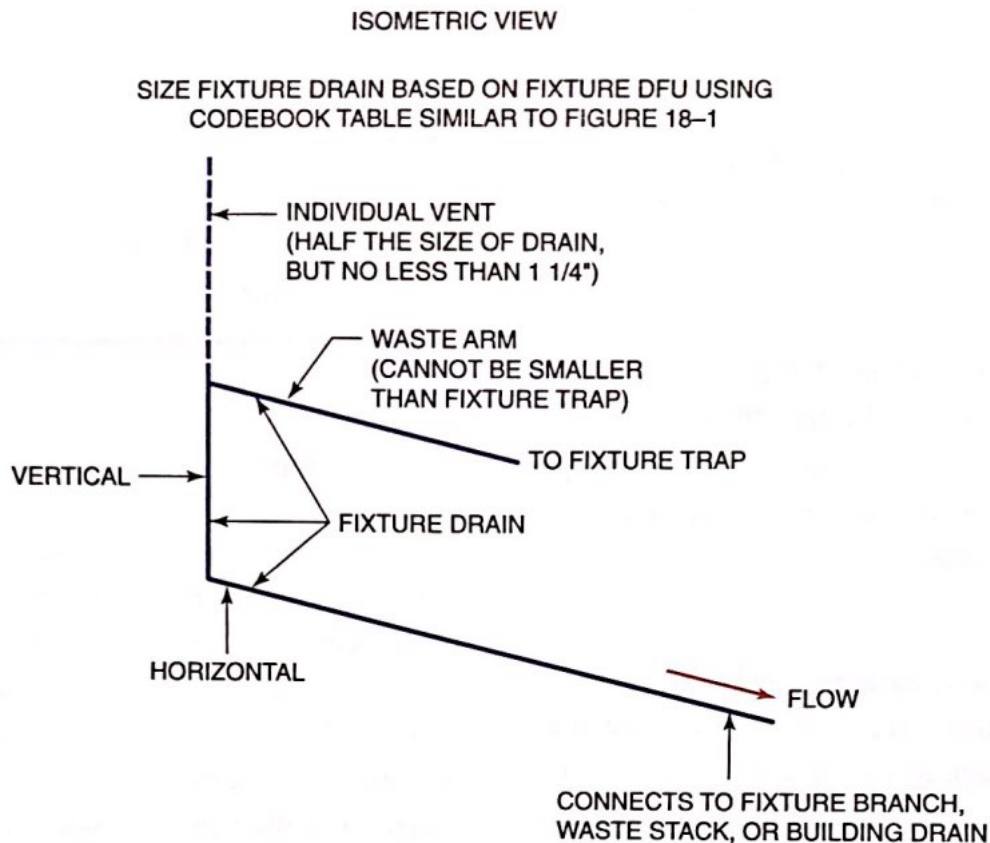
A fixture drain is sized based on the specific fixture and the use of a sizing table in a code
